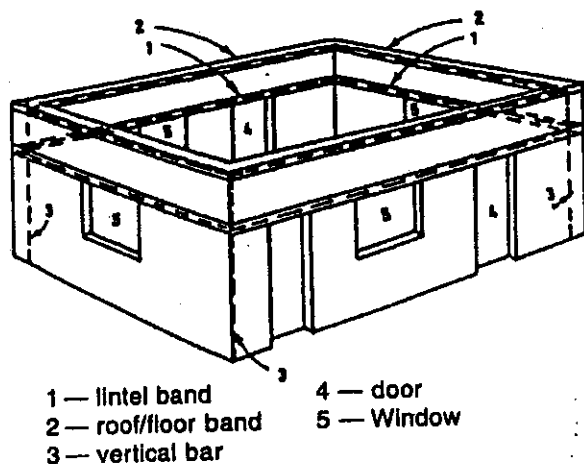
OVERALL ARRANGEMENT OF REINFORCING LOW STRENGTH MASONRY BUILDINGS
